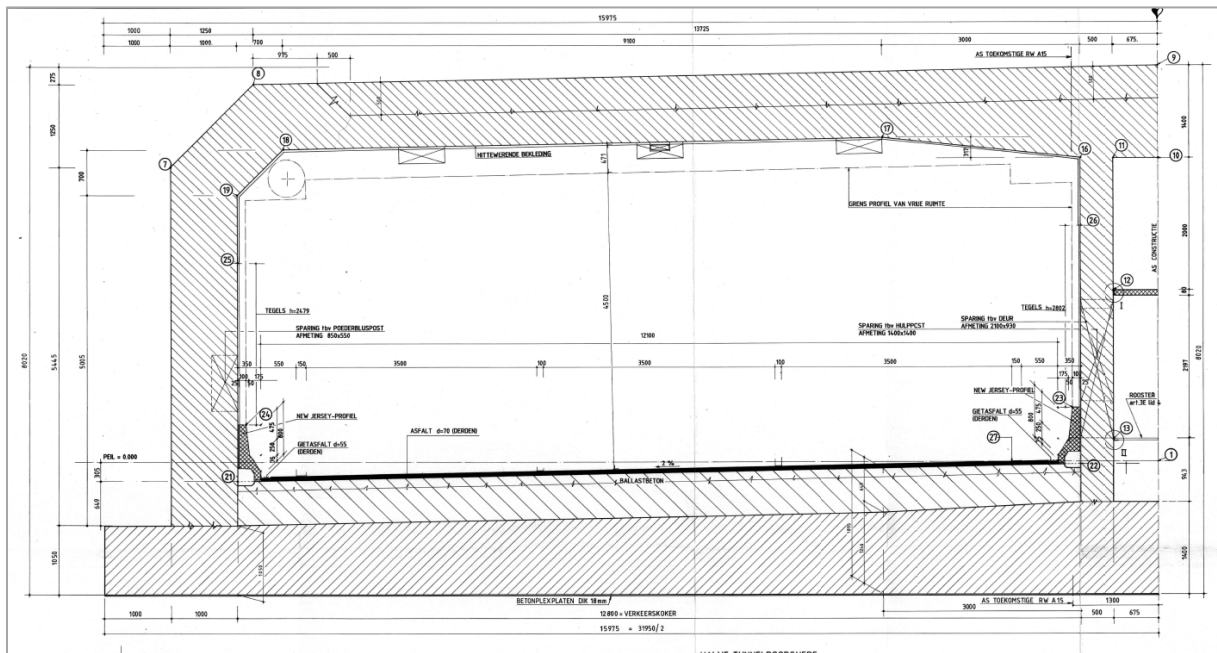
Details of the Noordtunnel cross section (archive Rijkswaterstaat).
